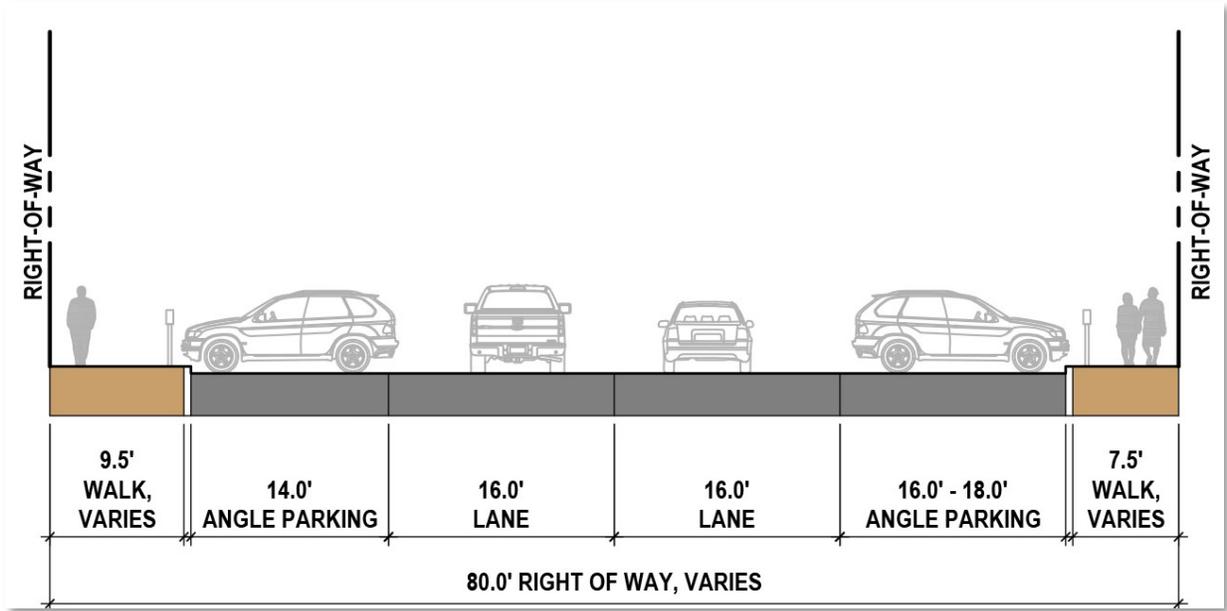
5th St - Existing Cross-Sections Between Road Ave & Grand Ave
